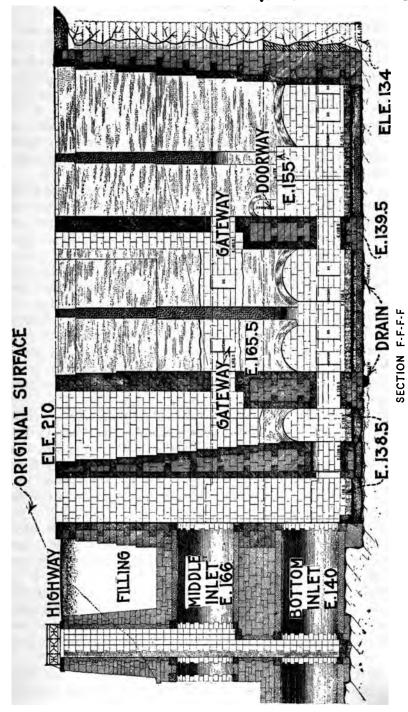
Inlet Gate-house of New Croton Aqueduct.
